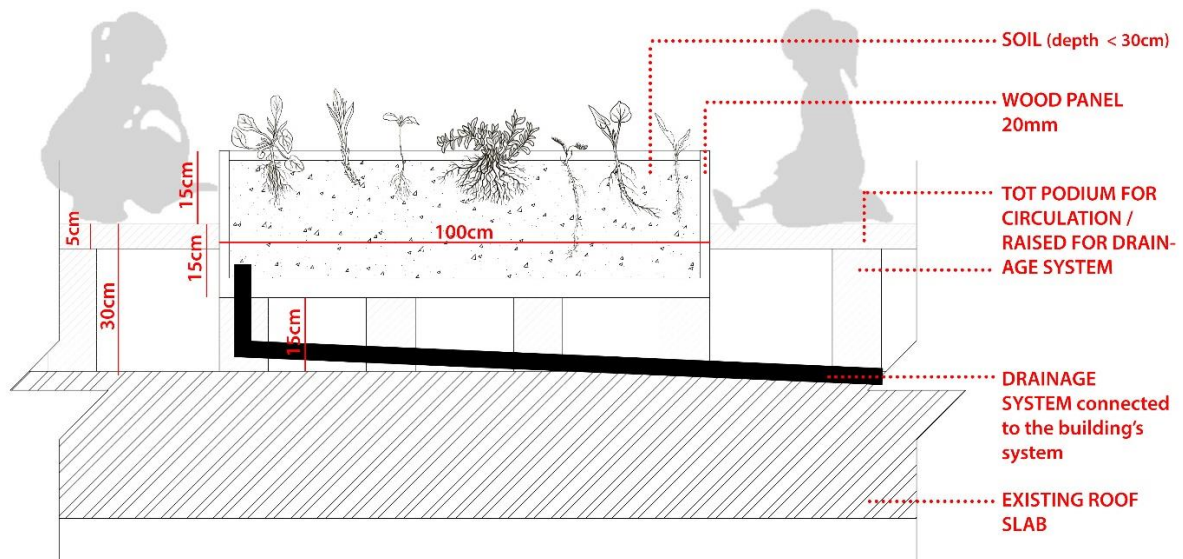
Module System for extensive green roof - section (Prepared by: author)
